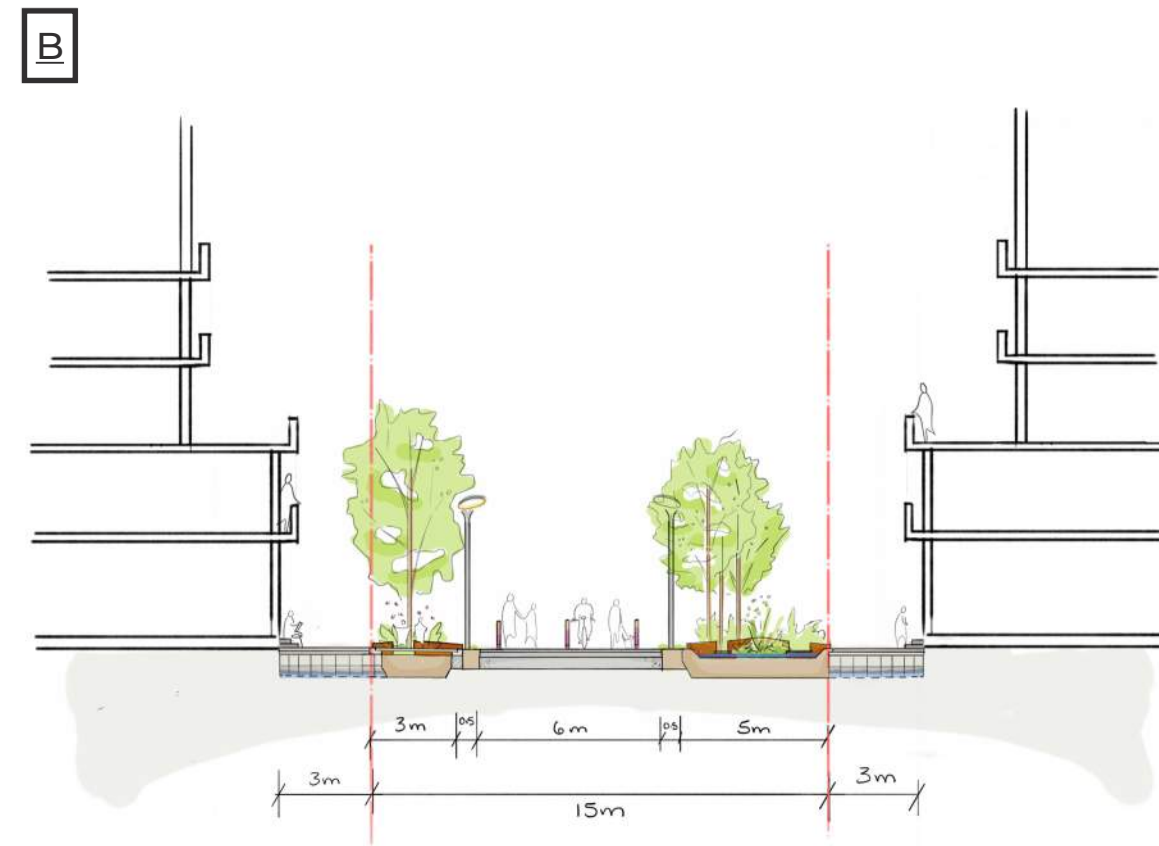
Typical cross section of the Selkirk Spillway pedestrian-only street.
